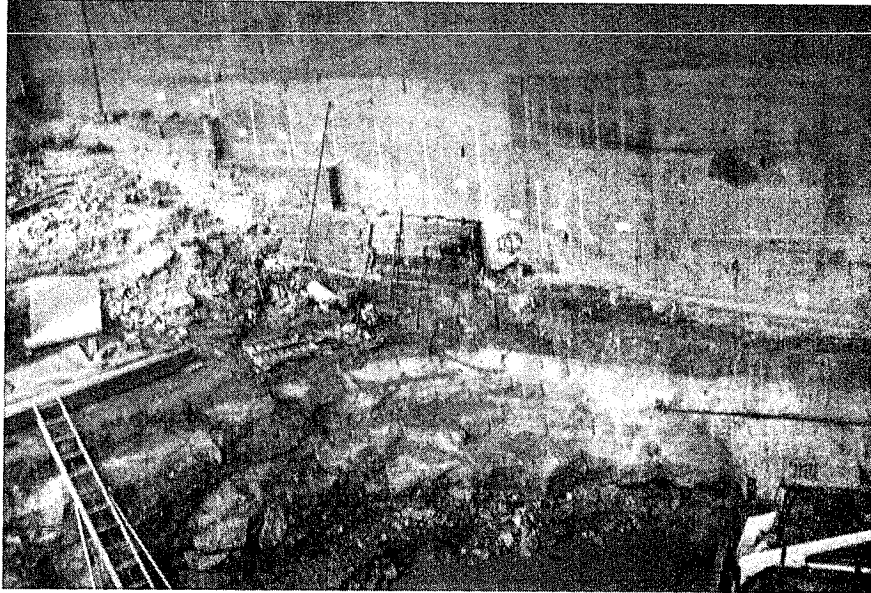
Status of the excavation site, April, 1991 (Note that the original surface was at the top of the concrete footing)..
